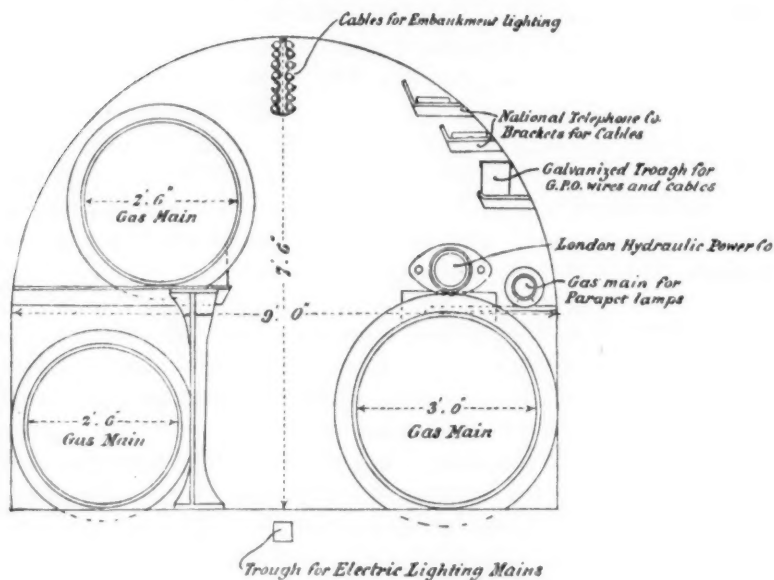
is a cross-section of the utility gallery upon the Victoria embankment. It is interesting to note the comparatively large space occupied by gas and the extremely small space occupied by the electric lighting, and it will be observed that cables are carried upon brackets and shelves.
